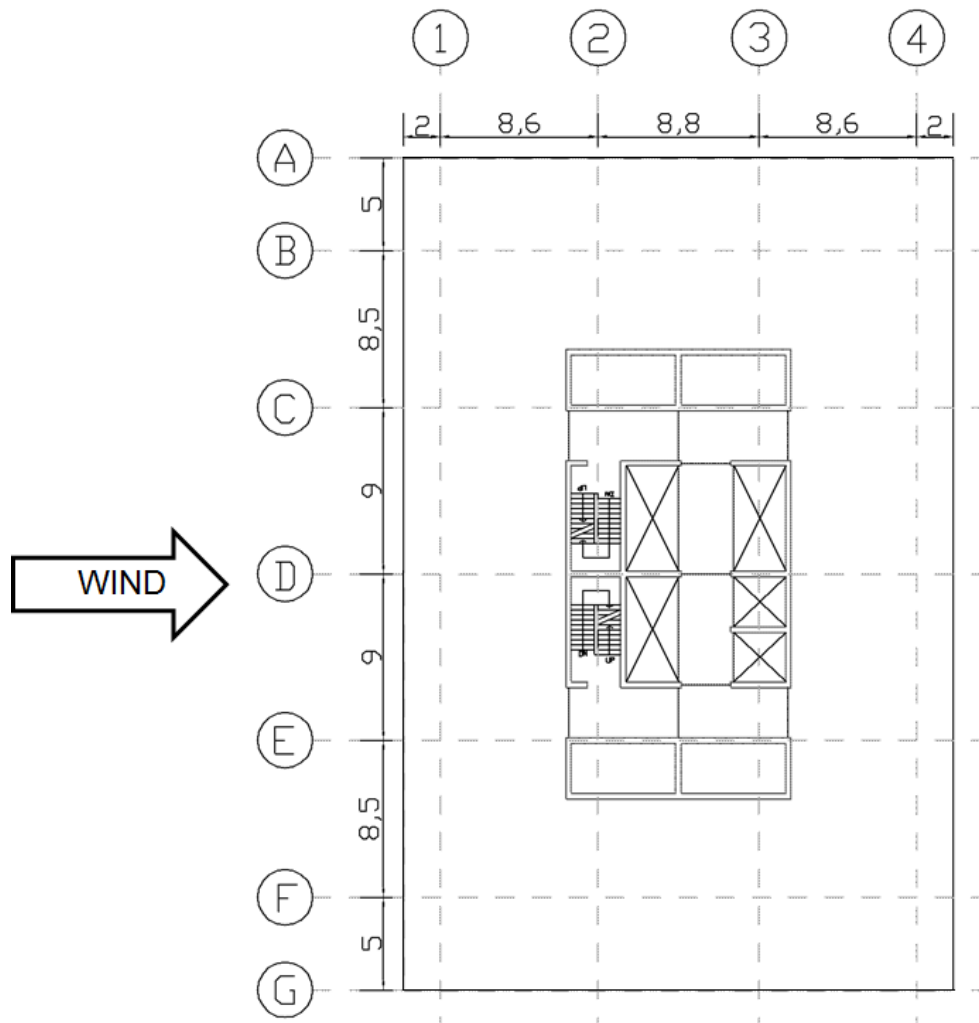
Typical floor plan of regular tall building (dimensions in metres)
